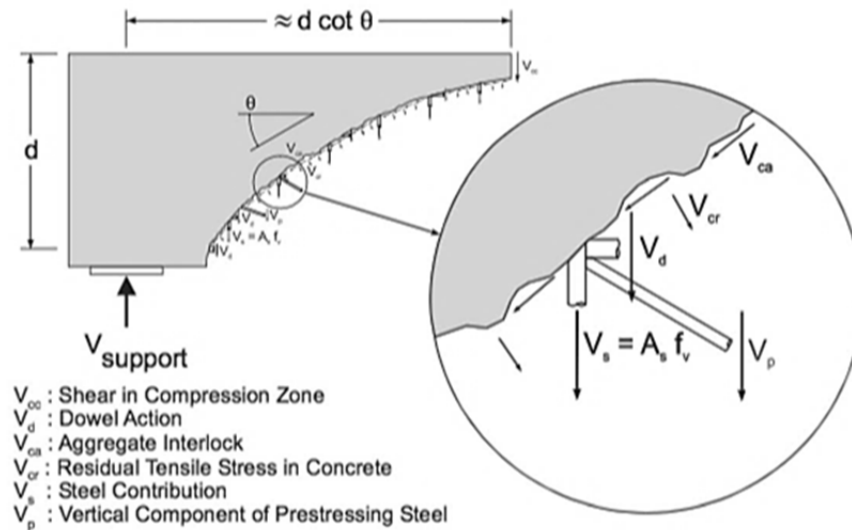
Components contributing to shear resistance of a steel reinforced concrete beam.
